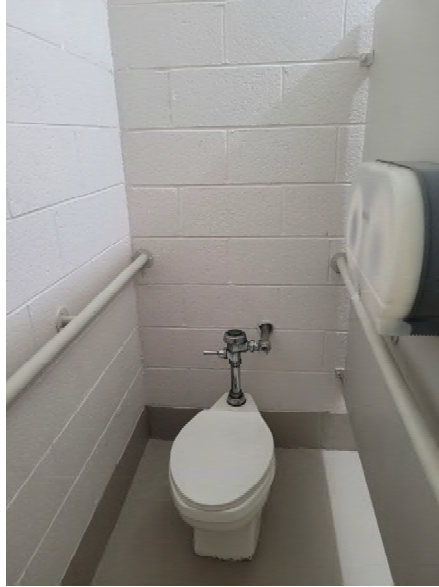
Jamestown Public Park Toilet Room Stall View 1
